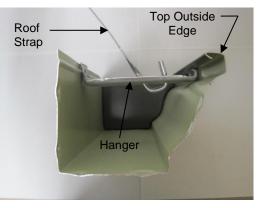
Typical Gutter Hanger and Roof Strap Attachment
